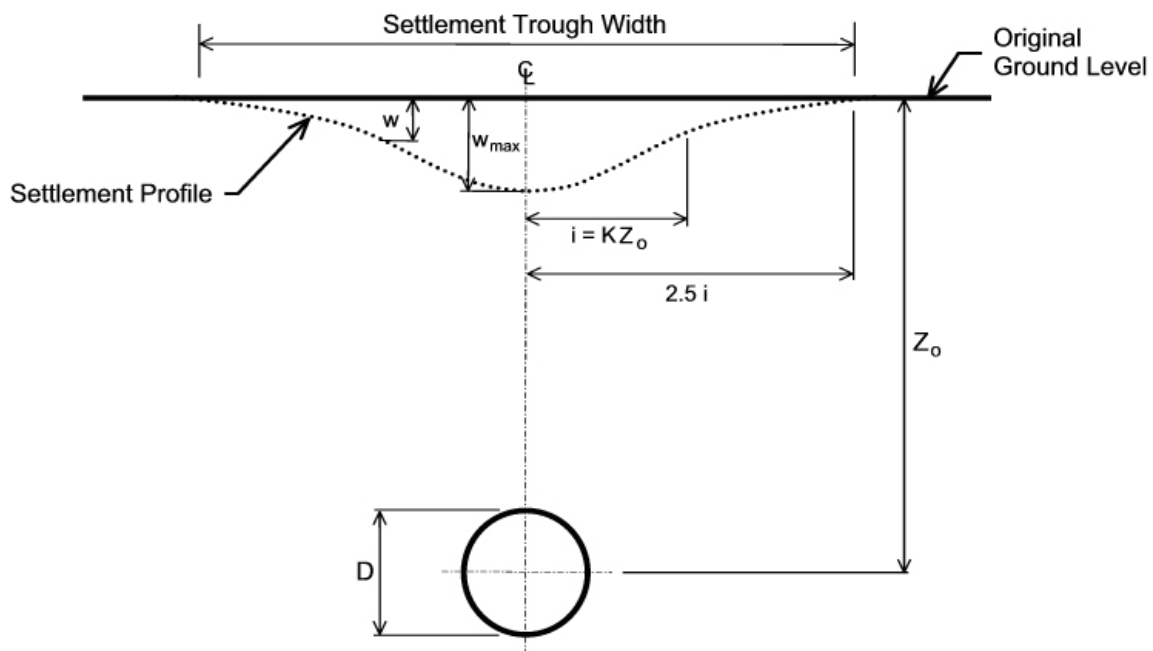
Typical Settlement Profile for a Soft Ground Tunneling
